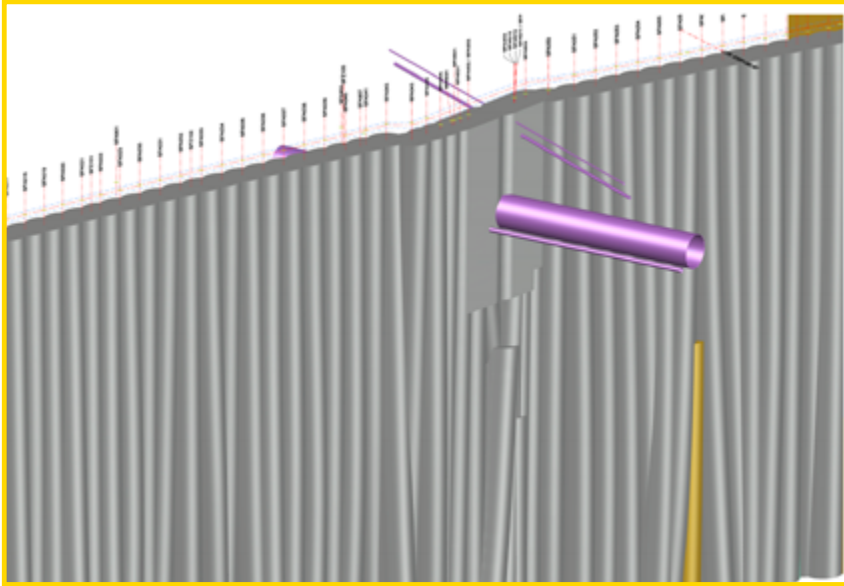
Section S1 panel execution | Pioneer Reservoir Outfall Crossing
